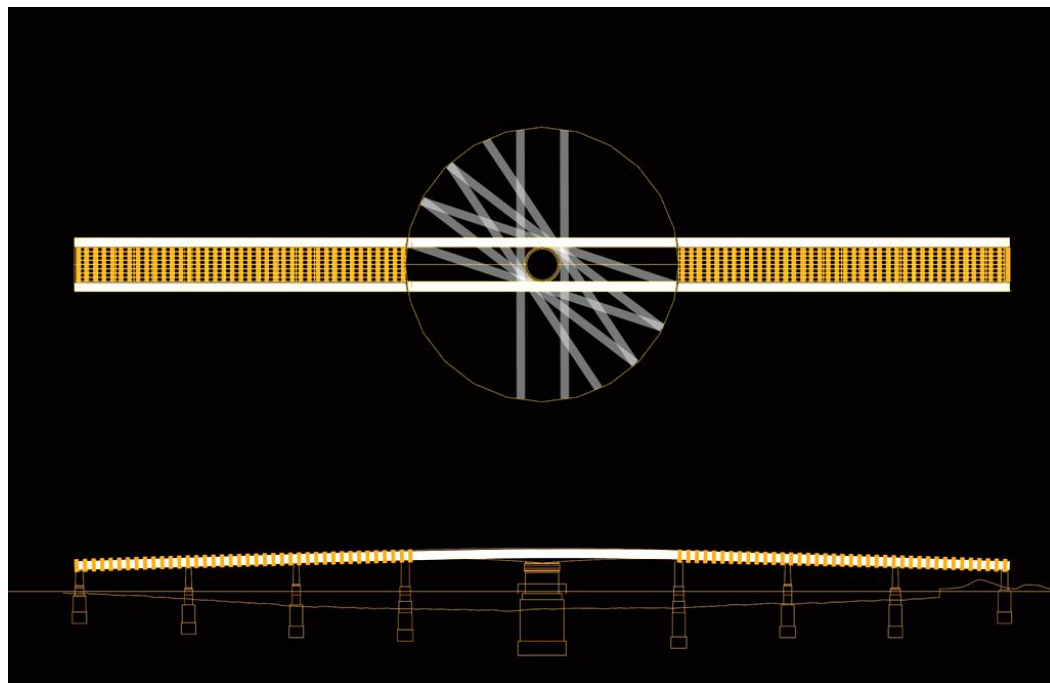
1976 Bridge Turnstyle Plan [Aroom]
